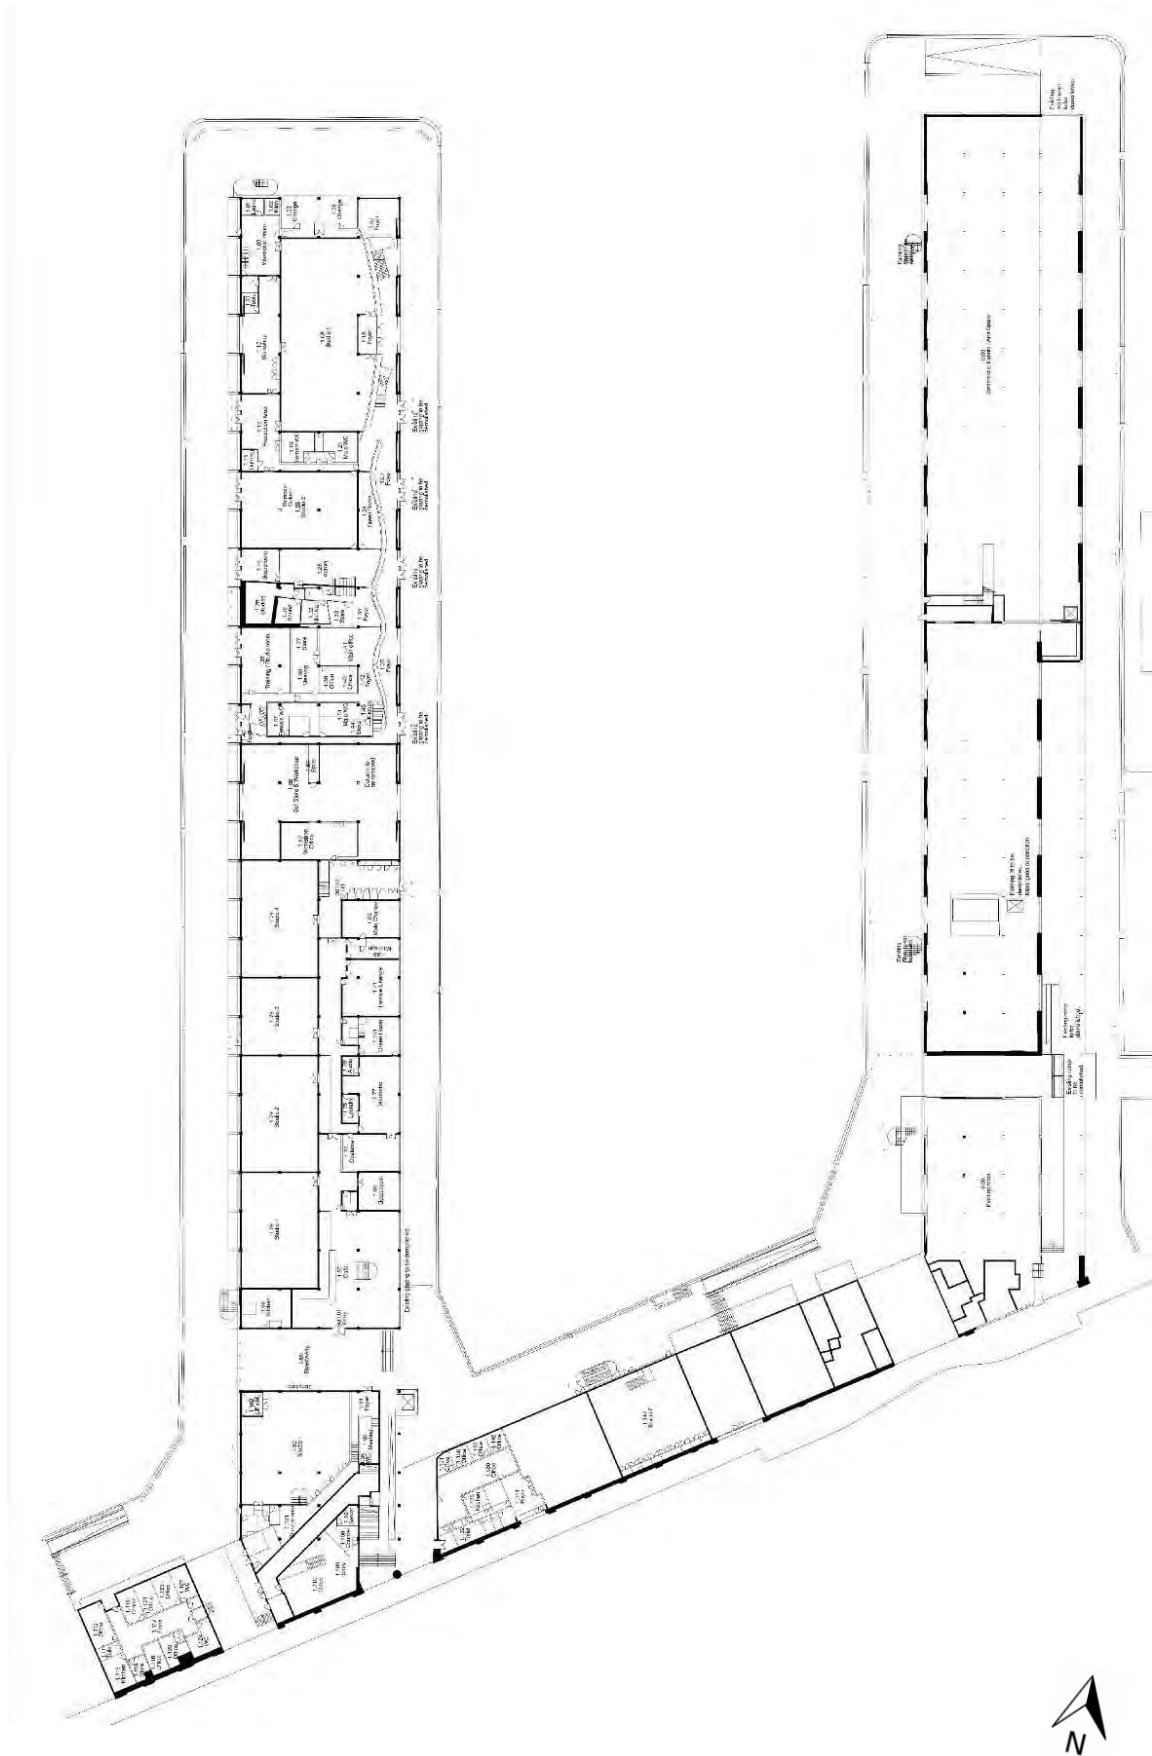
Existing Ground Floor Plan. Resource from TZG Architects.
